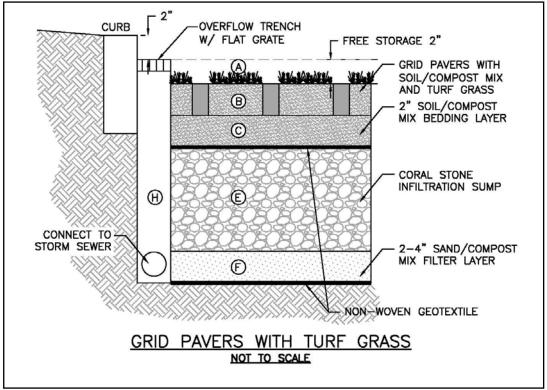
Cross-sections for Concrete Grid Paver (CGP) <u>infiltration</u> design version (no underdrain).
